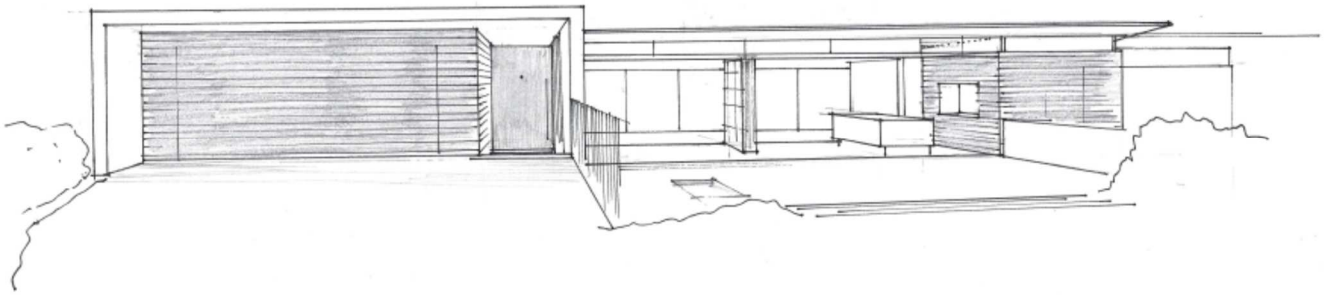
The dwelling's Bynya Road frontage presentation (excluding landscaping)
